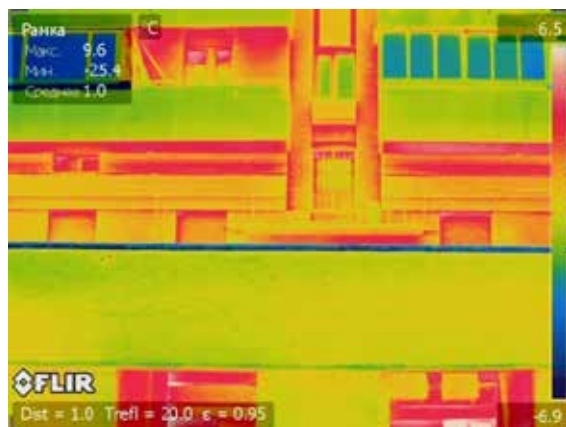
Heat leakage through the joints of walls and improperly designed balcony slab
